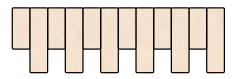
1:1 Alternating Staggered Depth Cross-Section.
